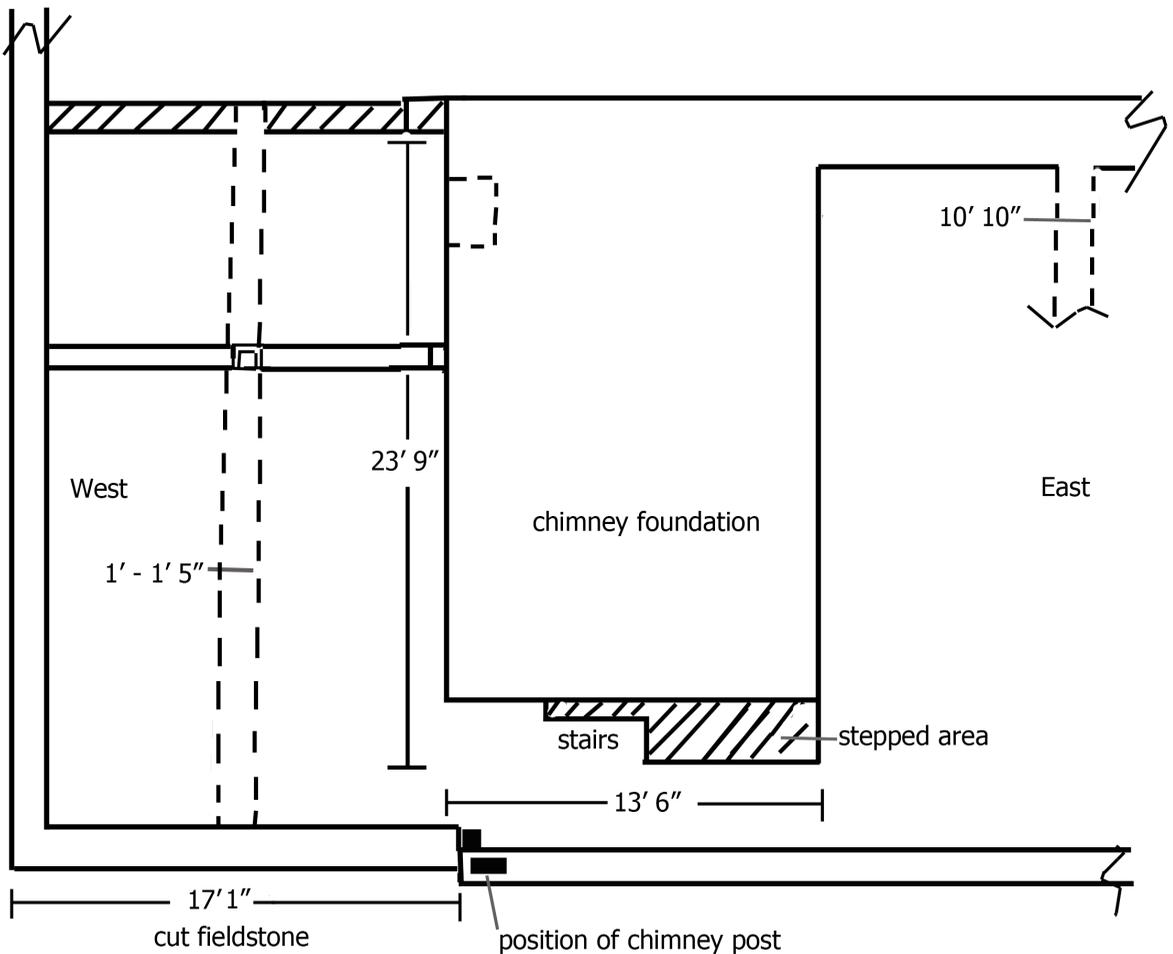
Sketch layout of the manor-house basement and its stone foundation walls and chimney, ca. 1690. (Figure by K. Ryzewski, 2011; adapted from an unpublished hand-drawn plan by John Carpenter, 2004.)
